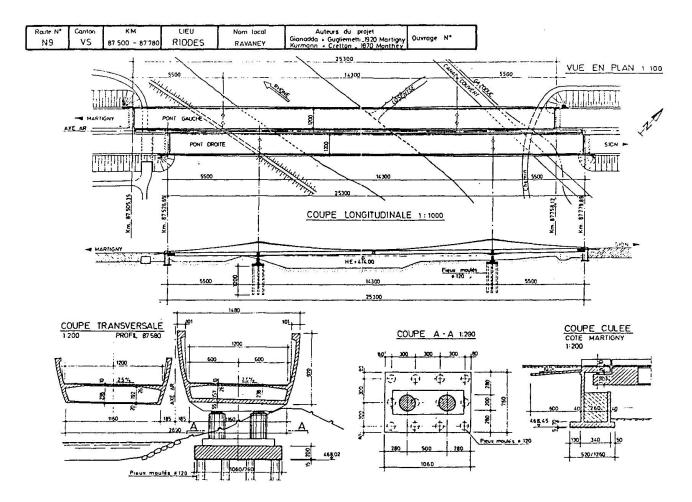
General situation, cross sections and a longitudinal section of the bridge in construction near Riddes.
